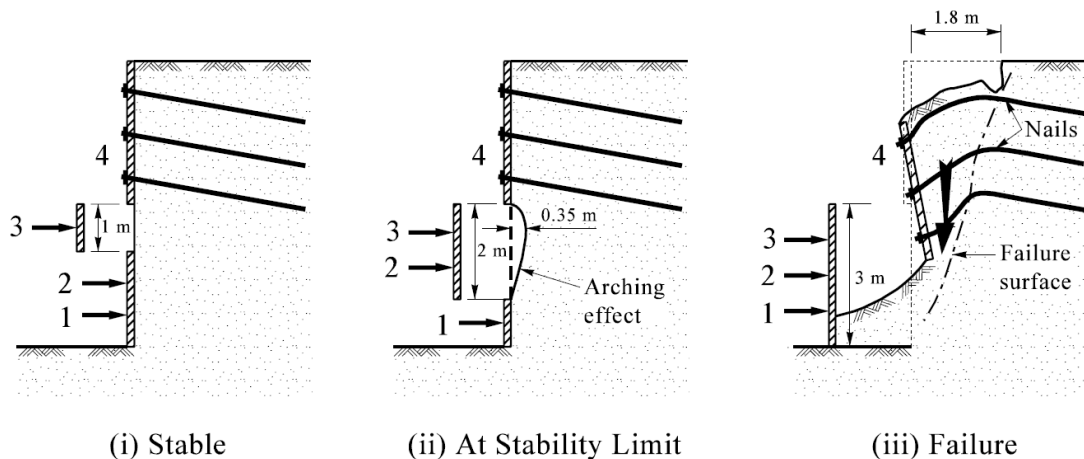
Stability of Excavation (after Plumelle and Schlosser, 1990)
